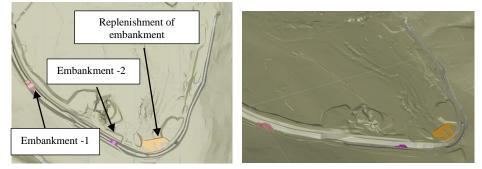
Position of the Embankment-1, Embankment-2 and embankment overhangs of the Ćehotina river bed
